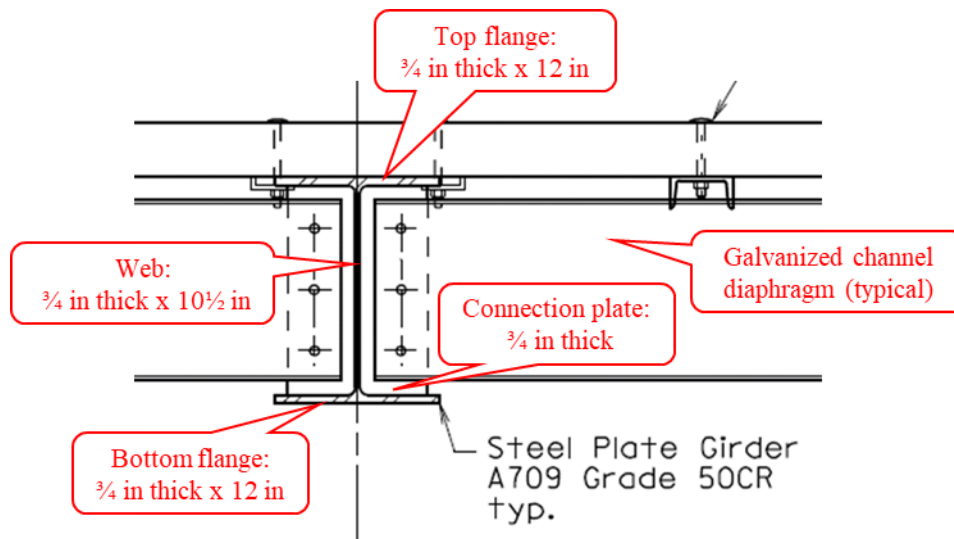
Typical Cross Section of the 50CR Steel Plate Girders Fabricated With 3/4-In-Thick Plates
